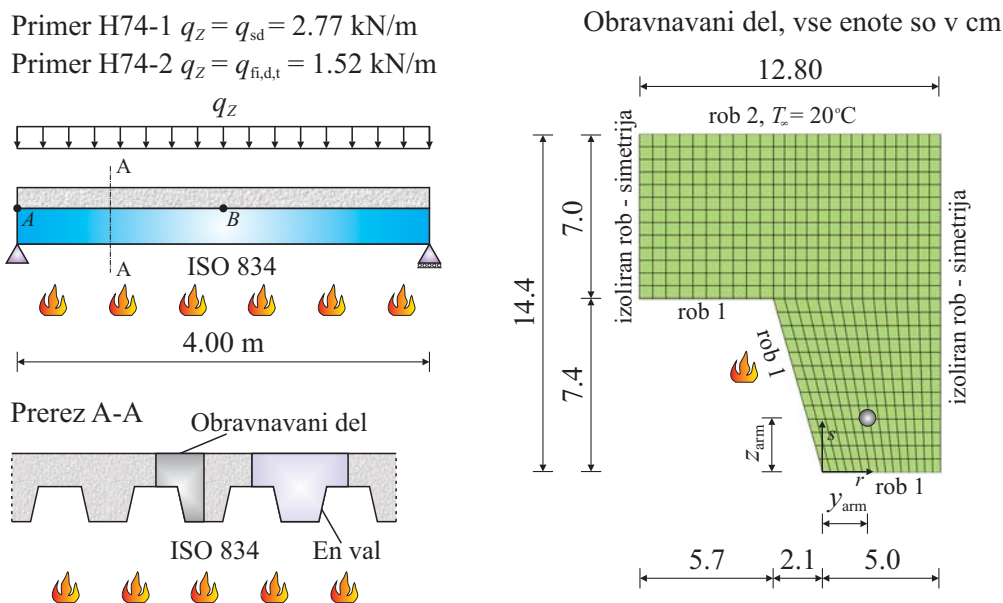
(a) Scheme of concrete plate with trapezoidal steel sheet, (b) cross-section of composite concrete plate H74.
